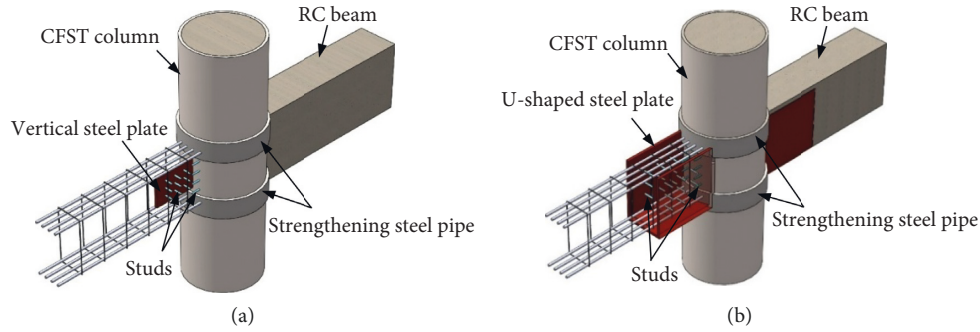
Schematic diagrams of the joints: (a) configuration of the steel plate-stud connection; (b) configuration of the U-shaped steel plate-stud connection.
